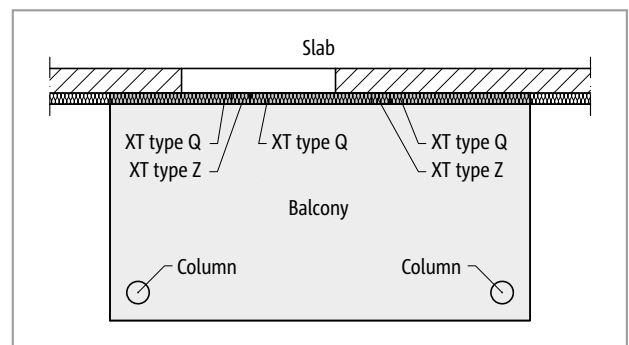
Schöck Isokorb® XT type Z, Q: Balcony with column support
